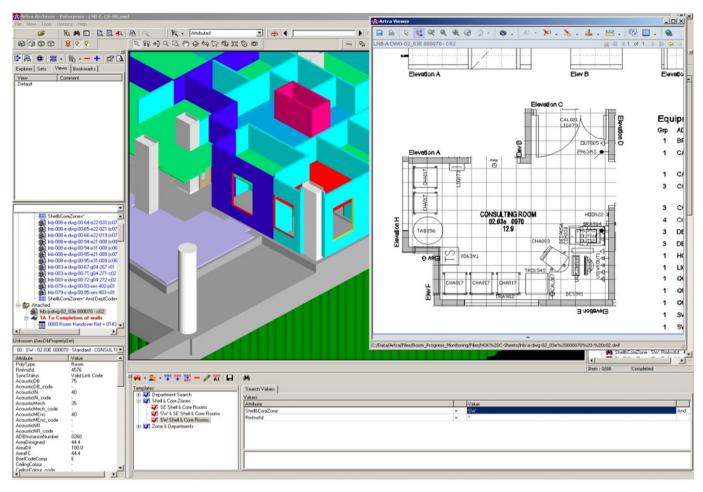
Using 3D viewer and Site dBase to access design drawings for consulting room.
